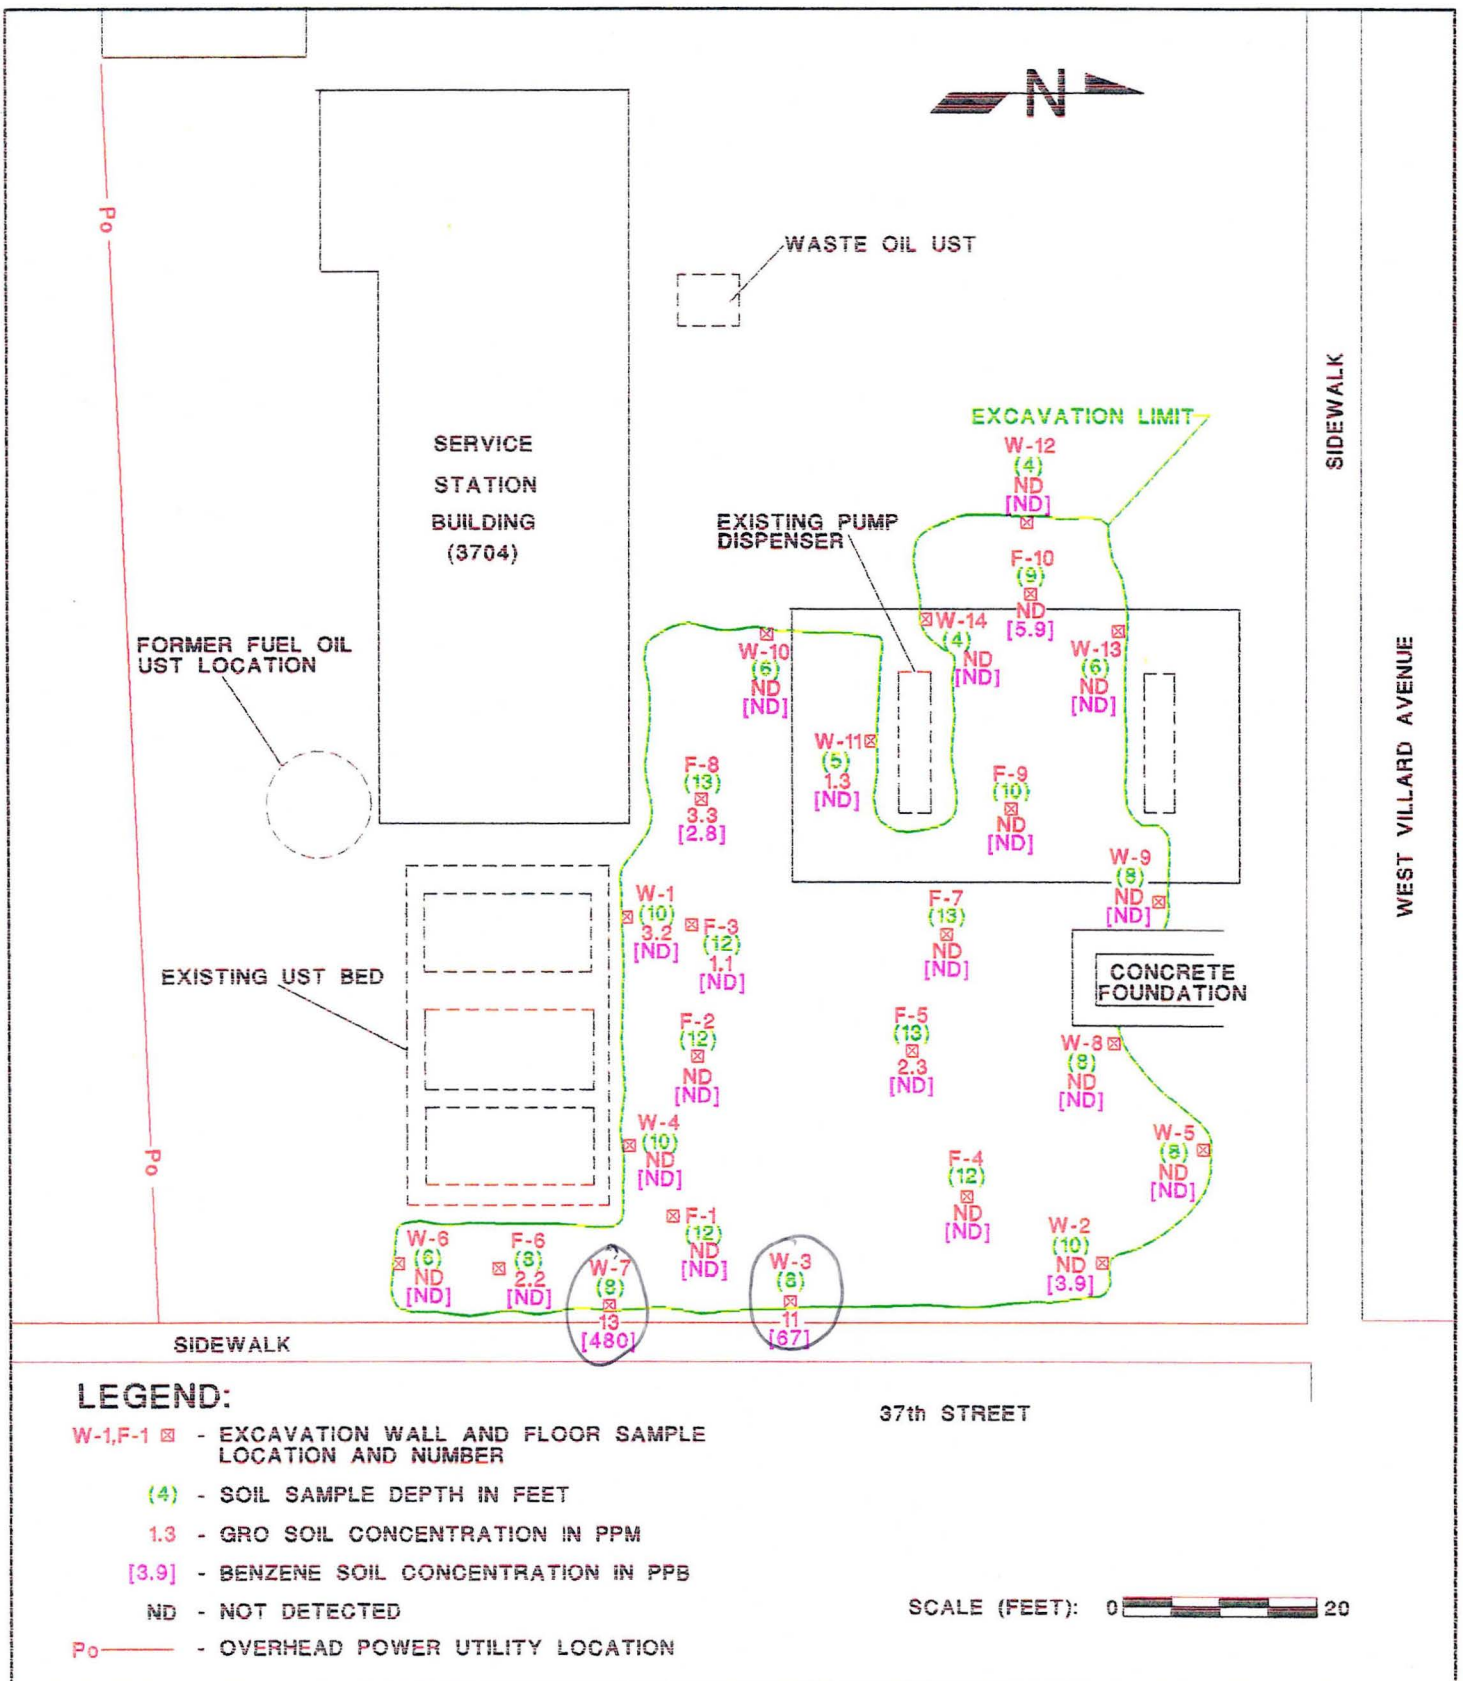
EXTENT OF EXCAVATION AND FLOOR/WALL SAMPLE RESULTS
